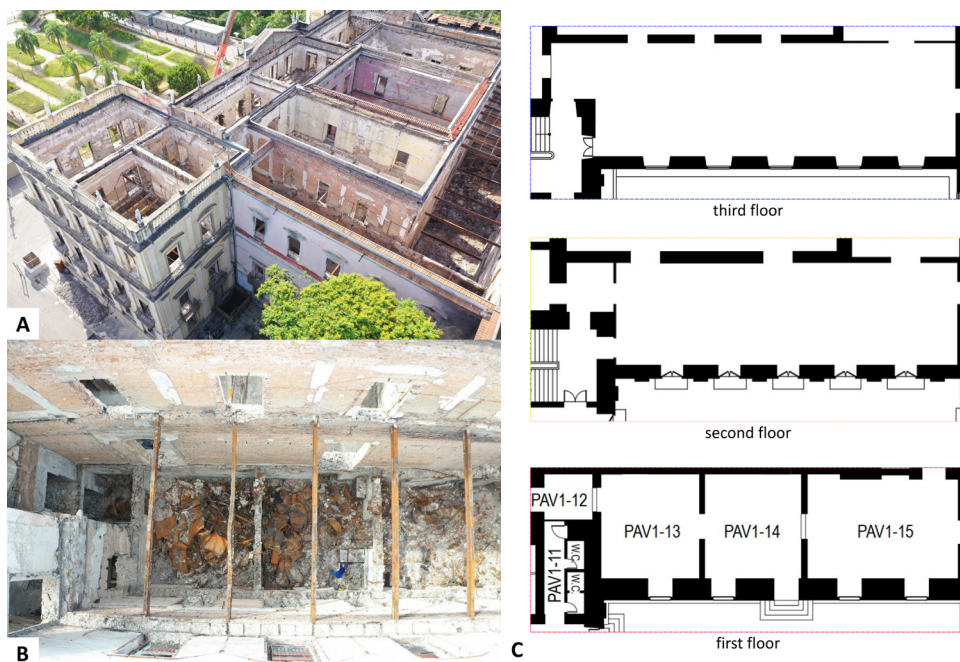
(A) Upper photo of the north façade of Paço de São Cristóvão and (B) upper photo of the excavation area (source: Orlando Grillo, Gabriel Cardoso and Victor Bittar, Núcleo de Resgate de Acervos). (C) floor plan of each building level and ground floor labeling (source: Núcleo de Resgate de Acervos).
